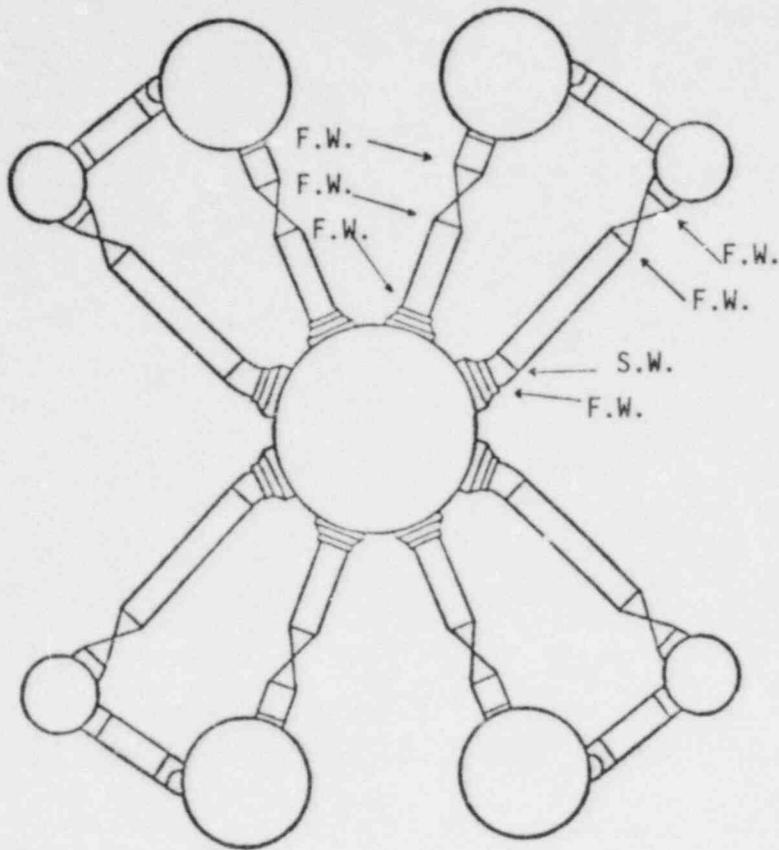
Weld location for Zion Units 1 and 2
